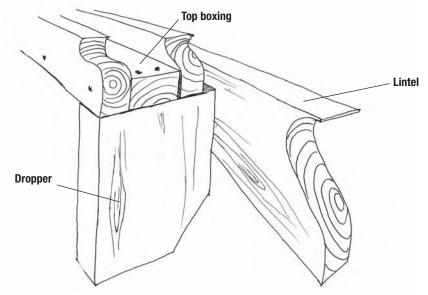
Dropped rolled head dropper joining the top boxing and window lintel for load bearing construction
